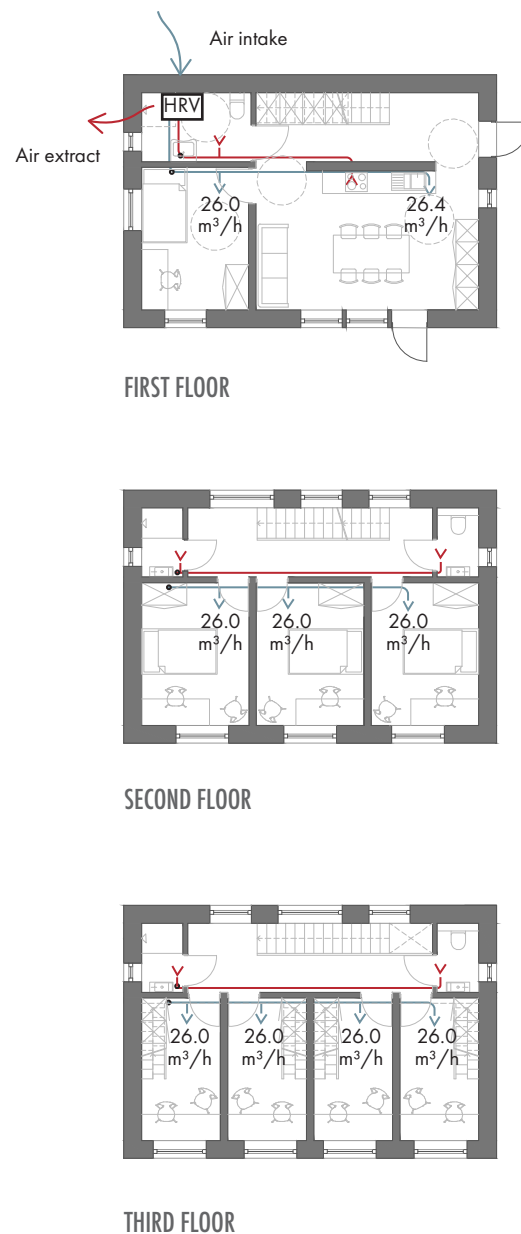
PLAN VIEW OF THE MECHANICAL VENTILATION SYSTEM, SCALE 1:200
